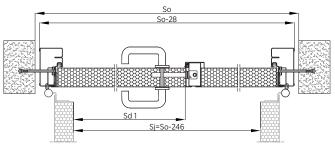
Installation of a double-leaf door to a masonry wall – internal frame with a thermal break - horizontal cross-section
